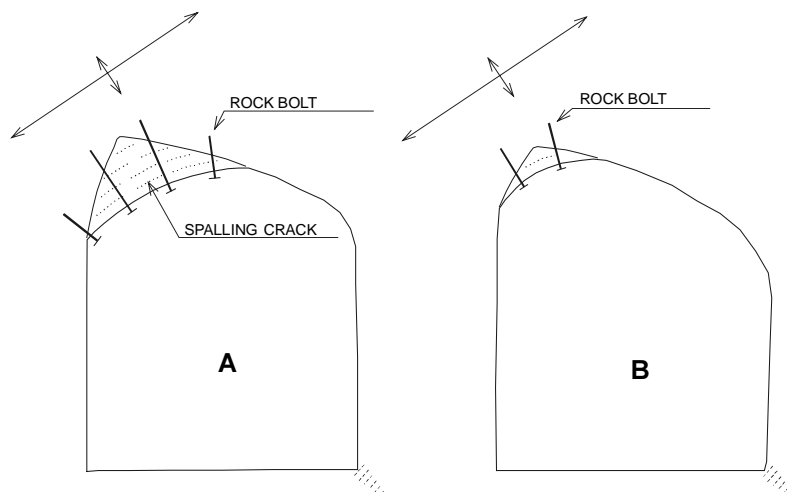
If high anisotropic stresses occur, the extent of spalling (or rock burst) may be reduced by favourably shaping the tunnel. 'A' shows the situation in a tunnel with symmetric shape, and 'B' the situation in the tunnel with an asymmetric shape with reduced radius (from Selmer-Olsen, 1988).
